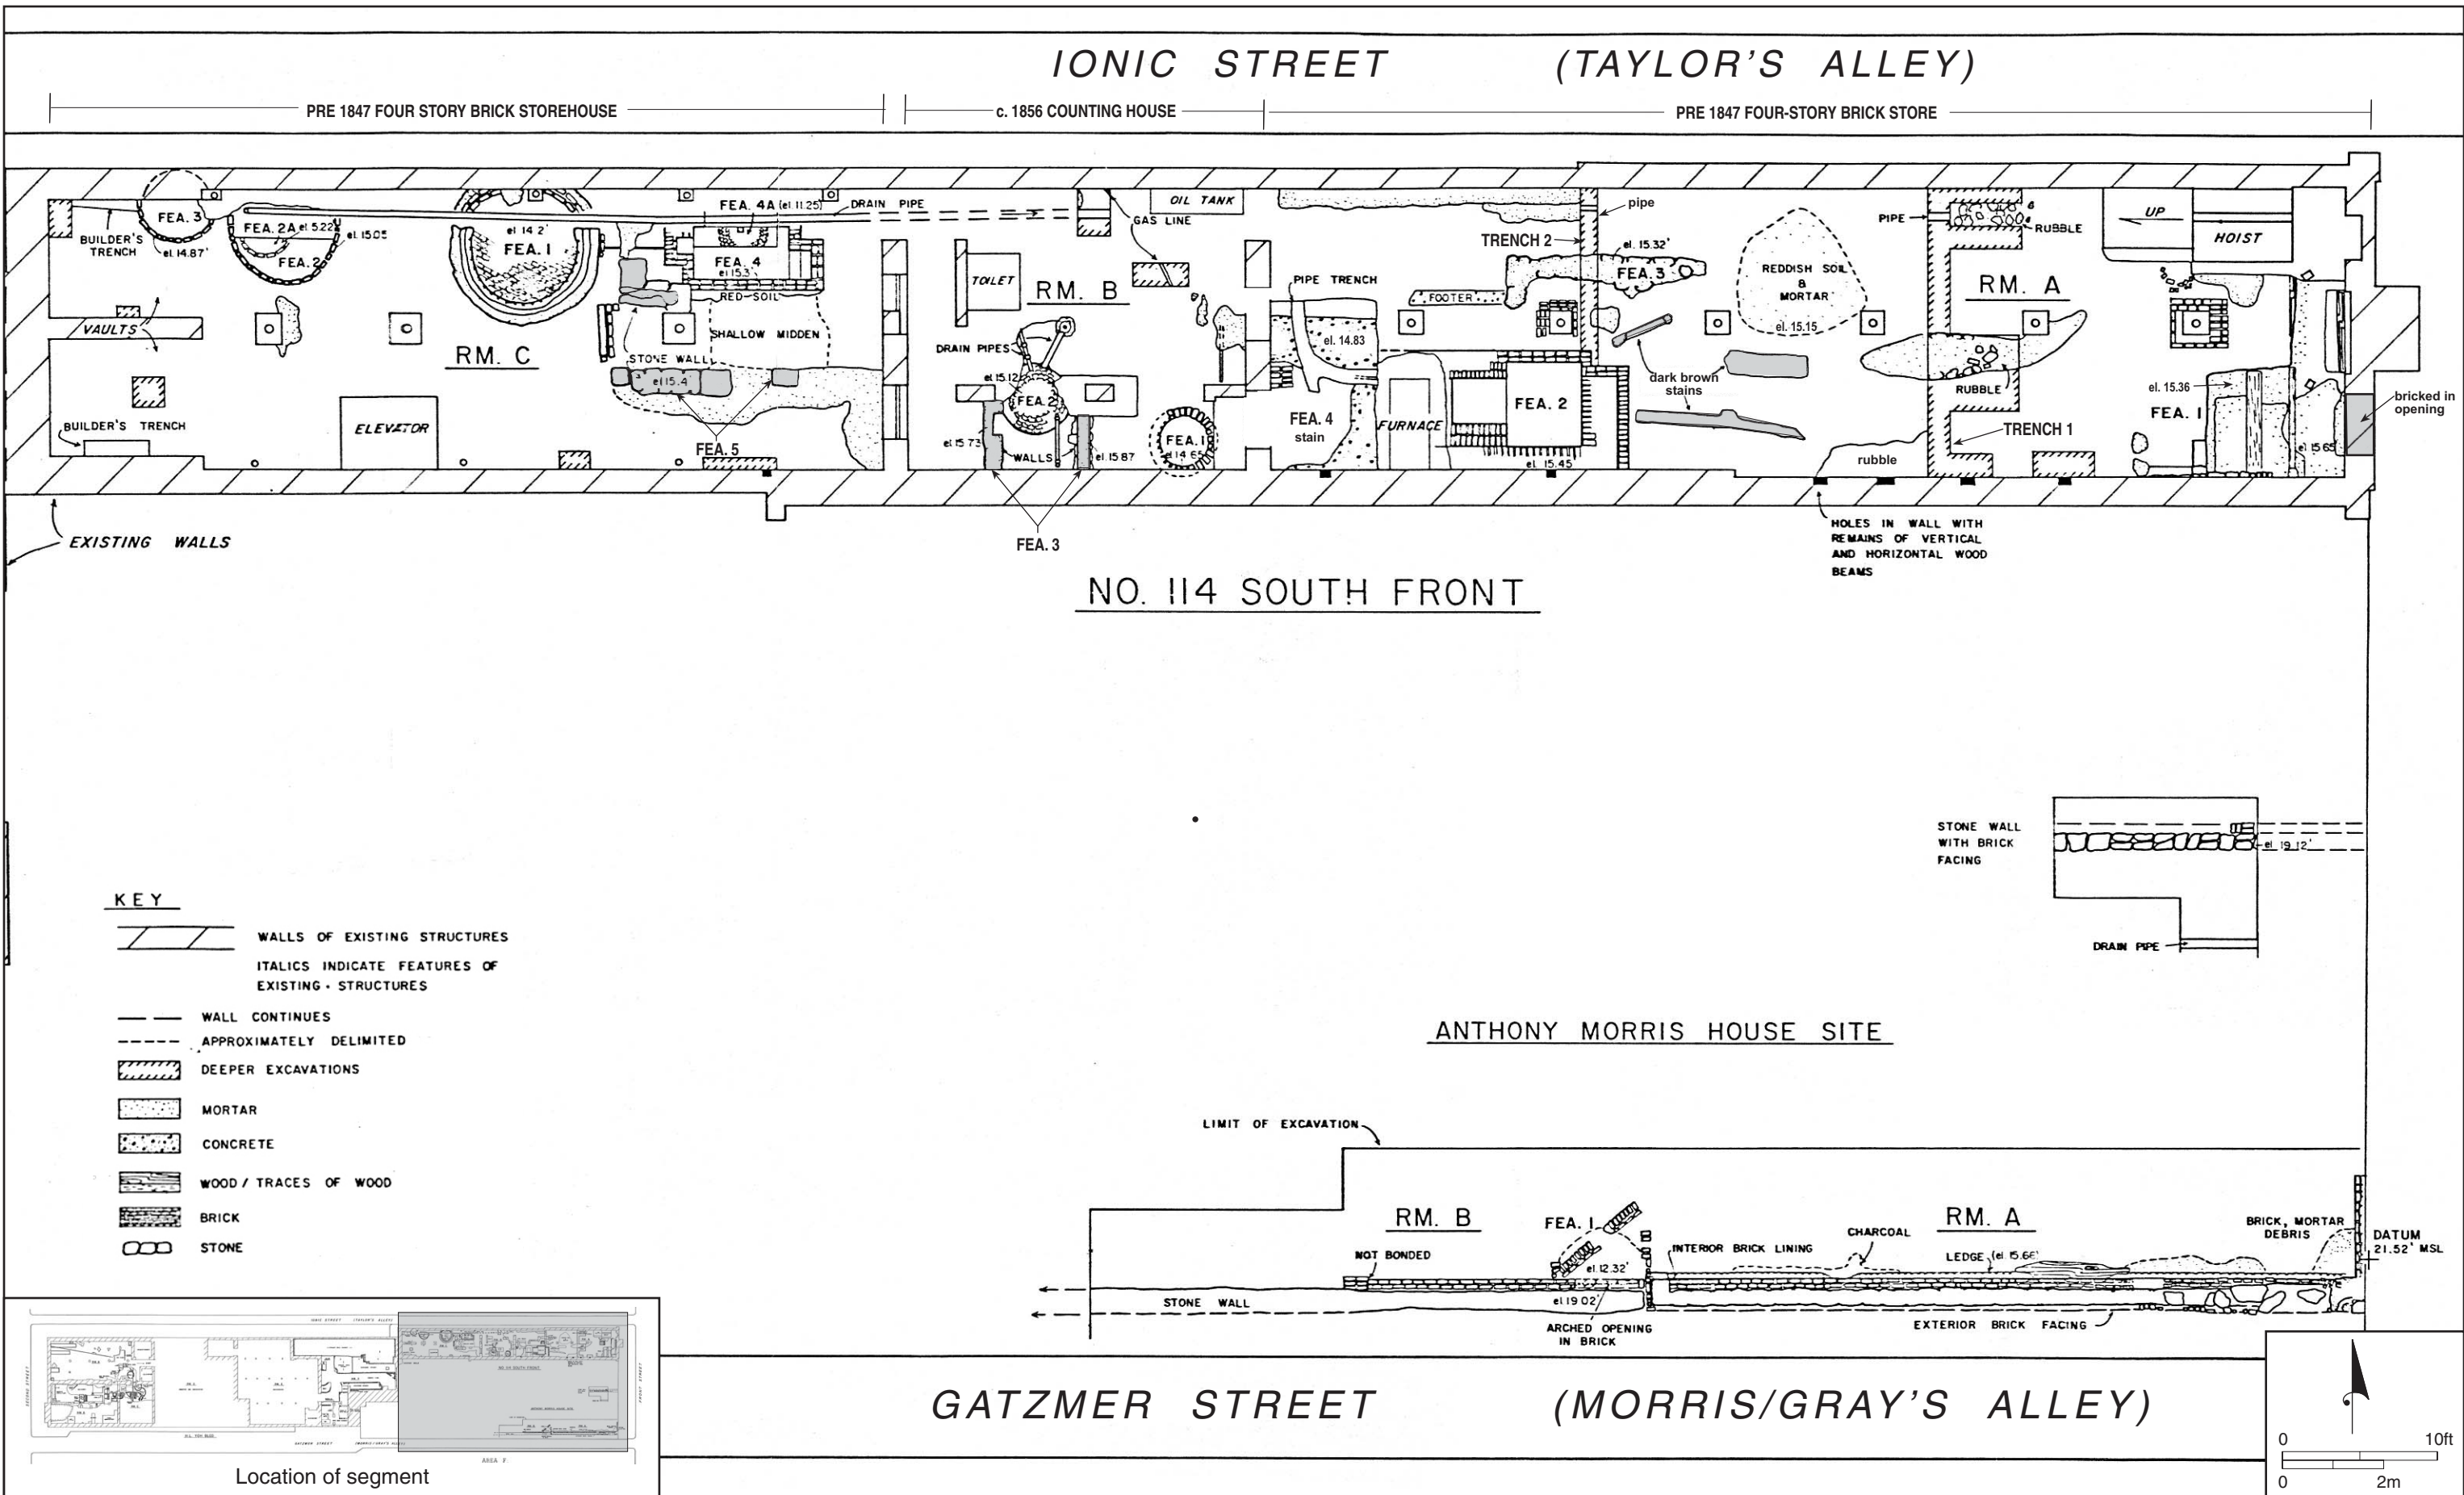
Plan of excavated trenches and exposed features at 114 South Front Street and the Anthony Morris House site (118 South Front Street).
